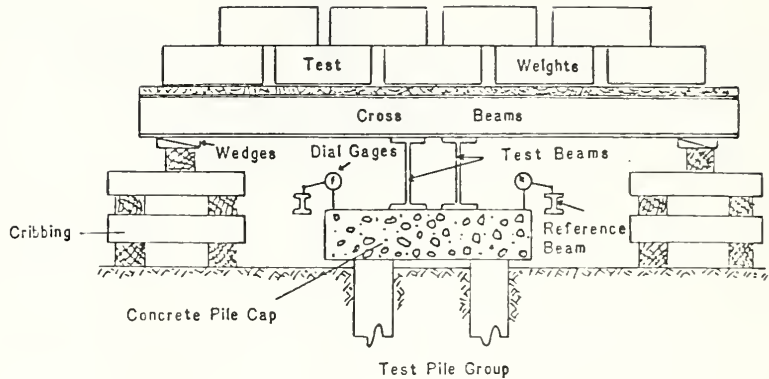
Possible Arrangement For Applying Load Test To Pile Group Using Weighted Platform ( ASTM , 1981 )
